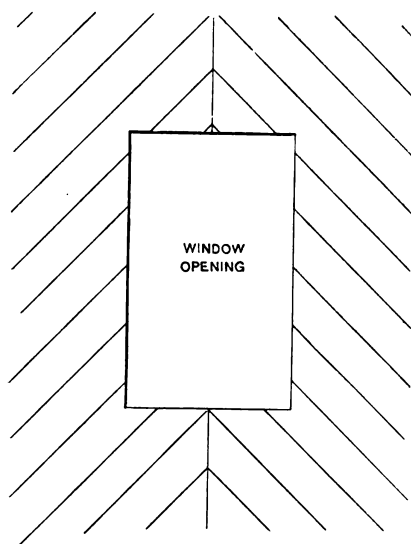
Sheeting Boards Placed so as to "Joint" on a Center Line Above and Below the Window Opening.
